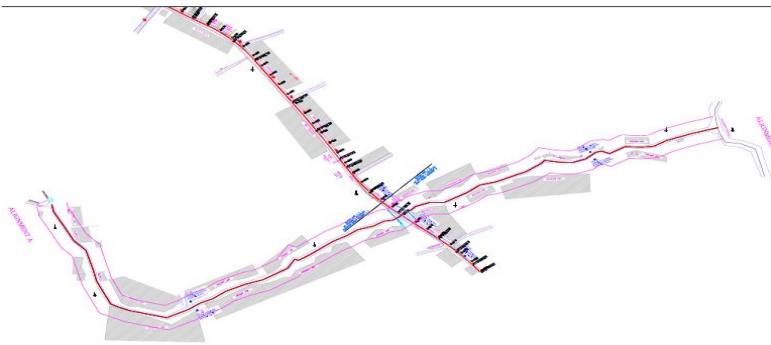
Oke Ayo Tuntun Box Culvert Engineering Design/ Topography Survey
